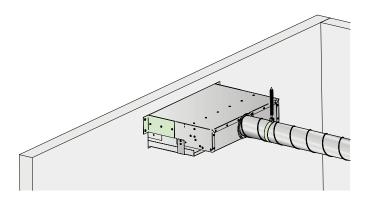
Anchoring in the wall, mounted with bracket's on the sides and pushed through the opening.
